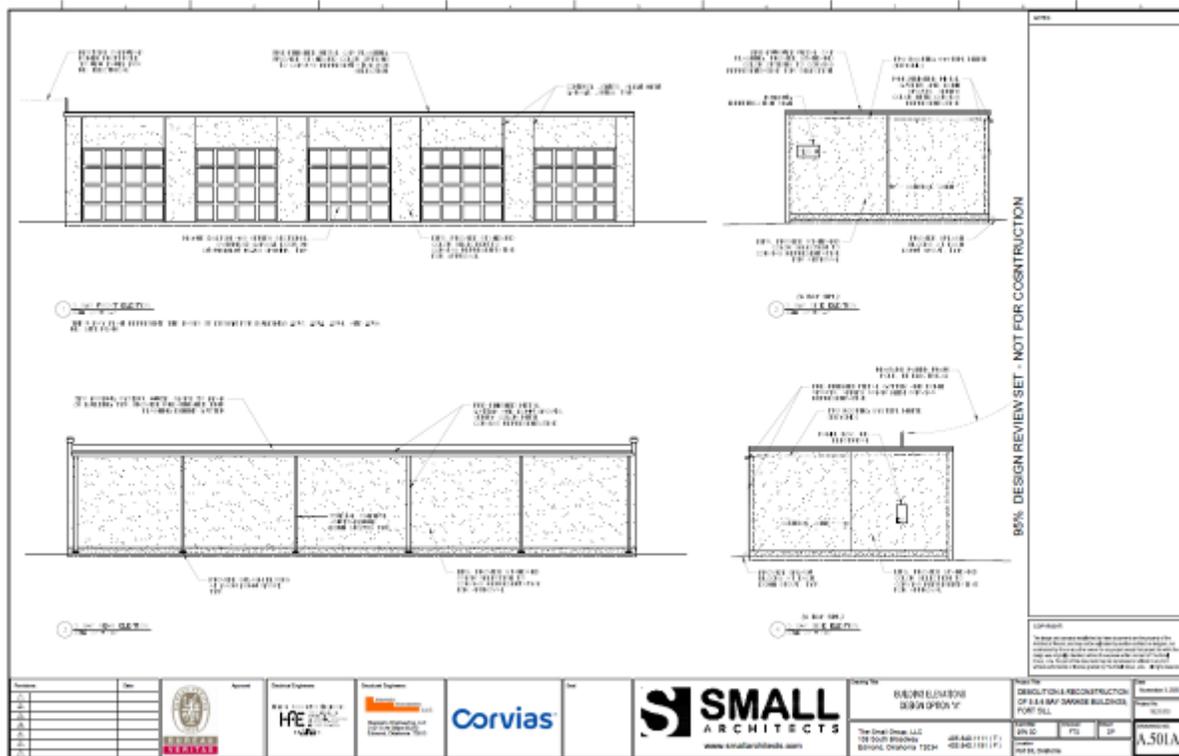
Architectural plan for new garage replacement construction at Fort Sill
